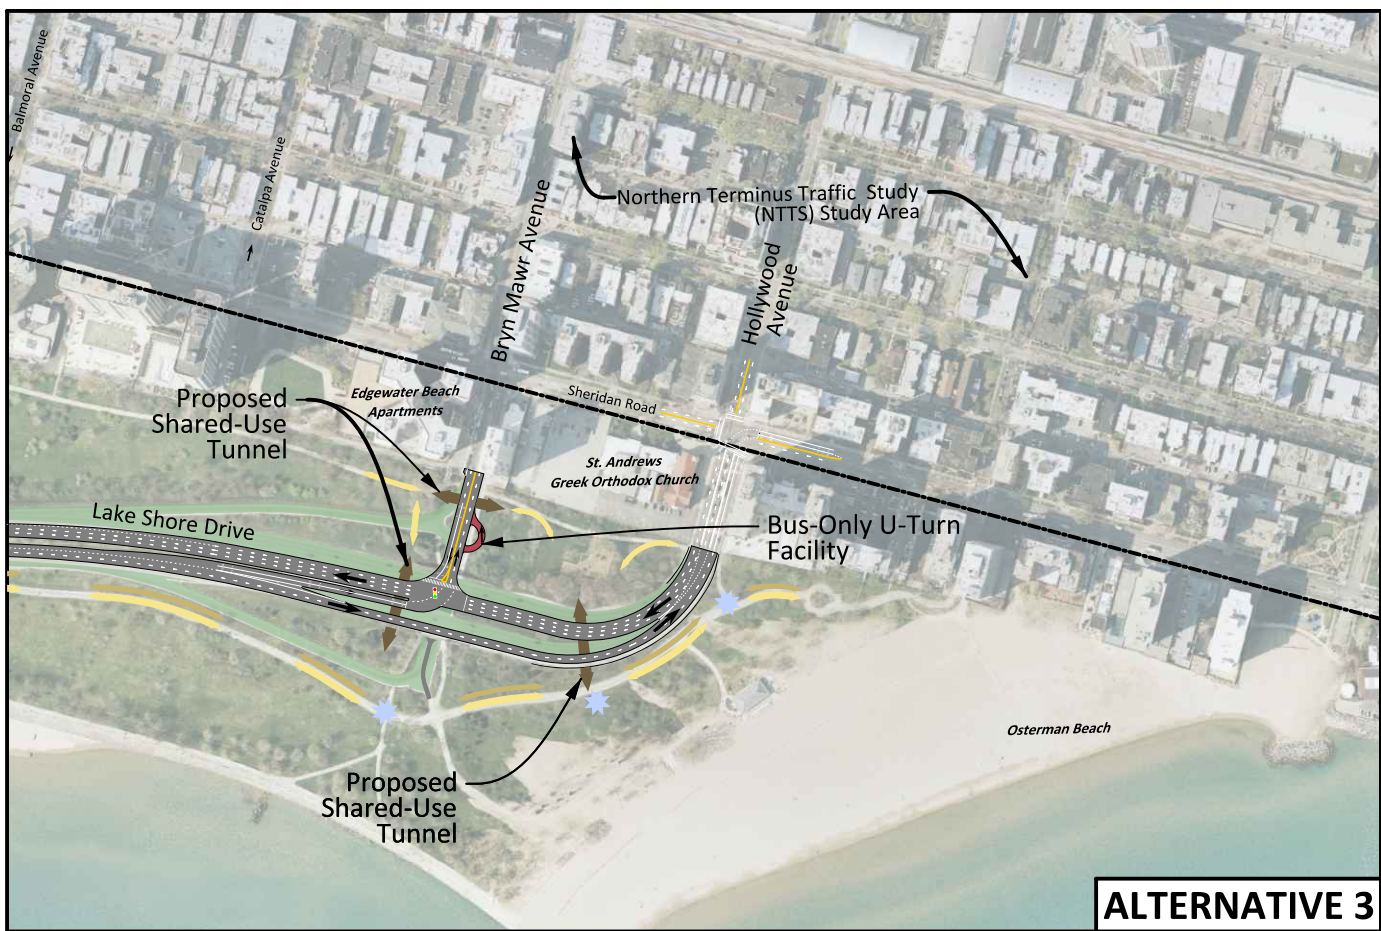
Bryn Mawr Avenue and Hollywood Avenue Junction Alternatives
